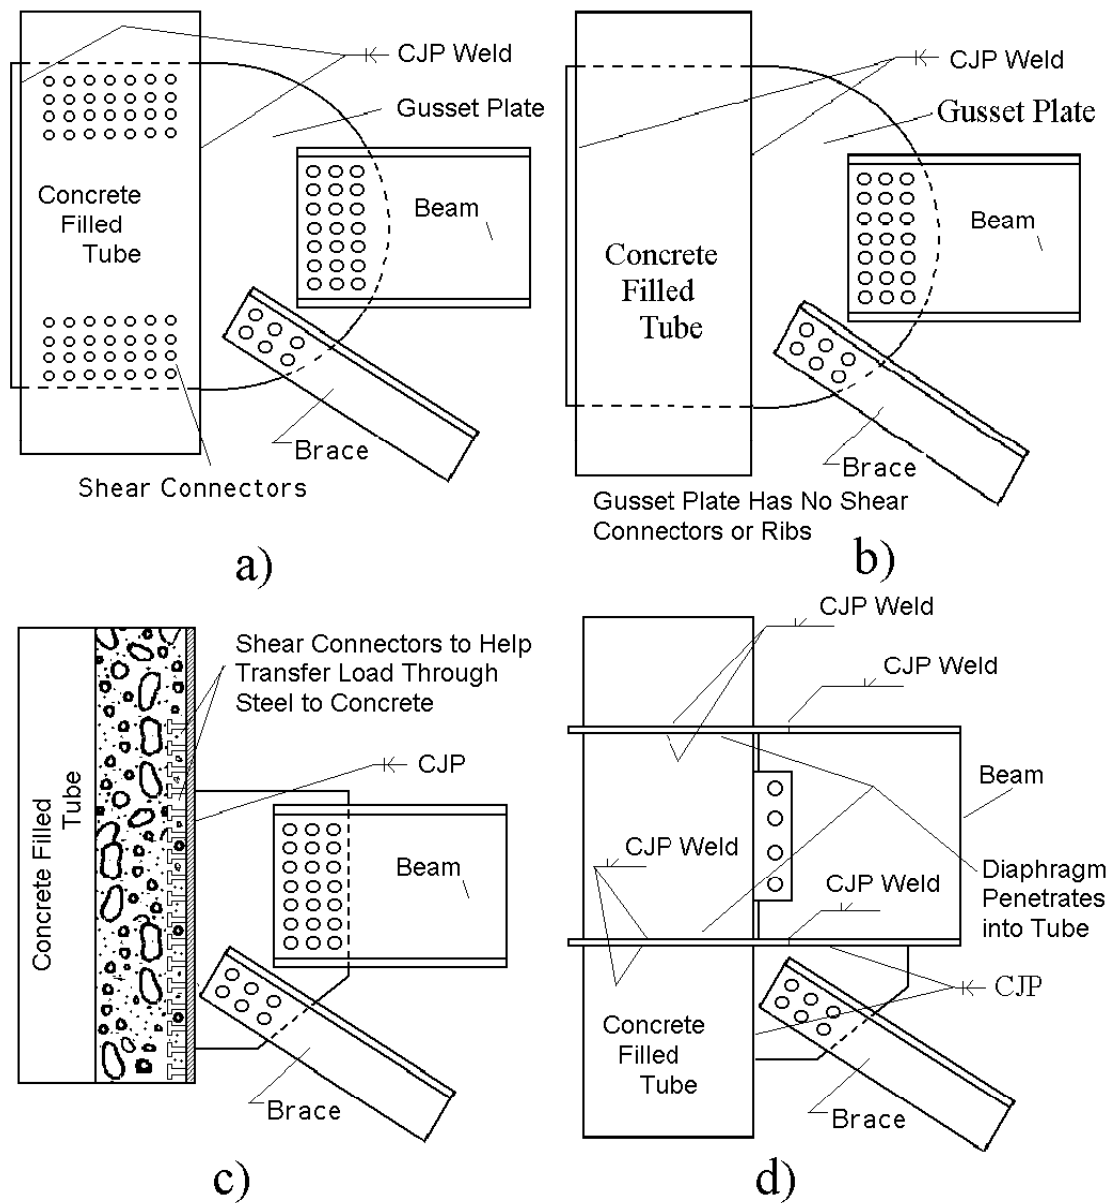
Typical Brace-Beam- Column Connections for Braced Frames with CFT Columns
